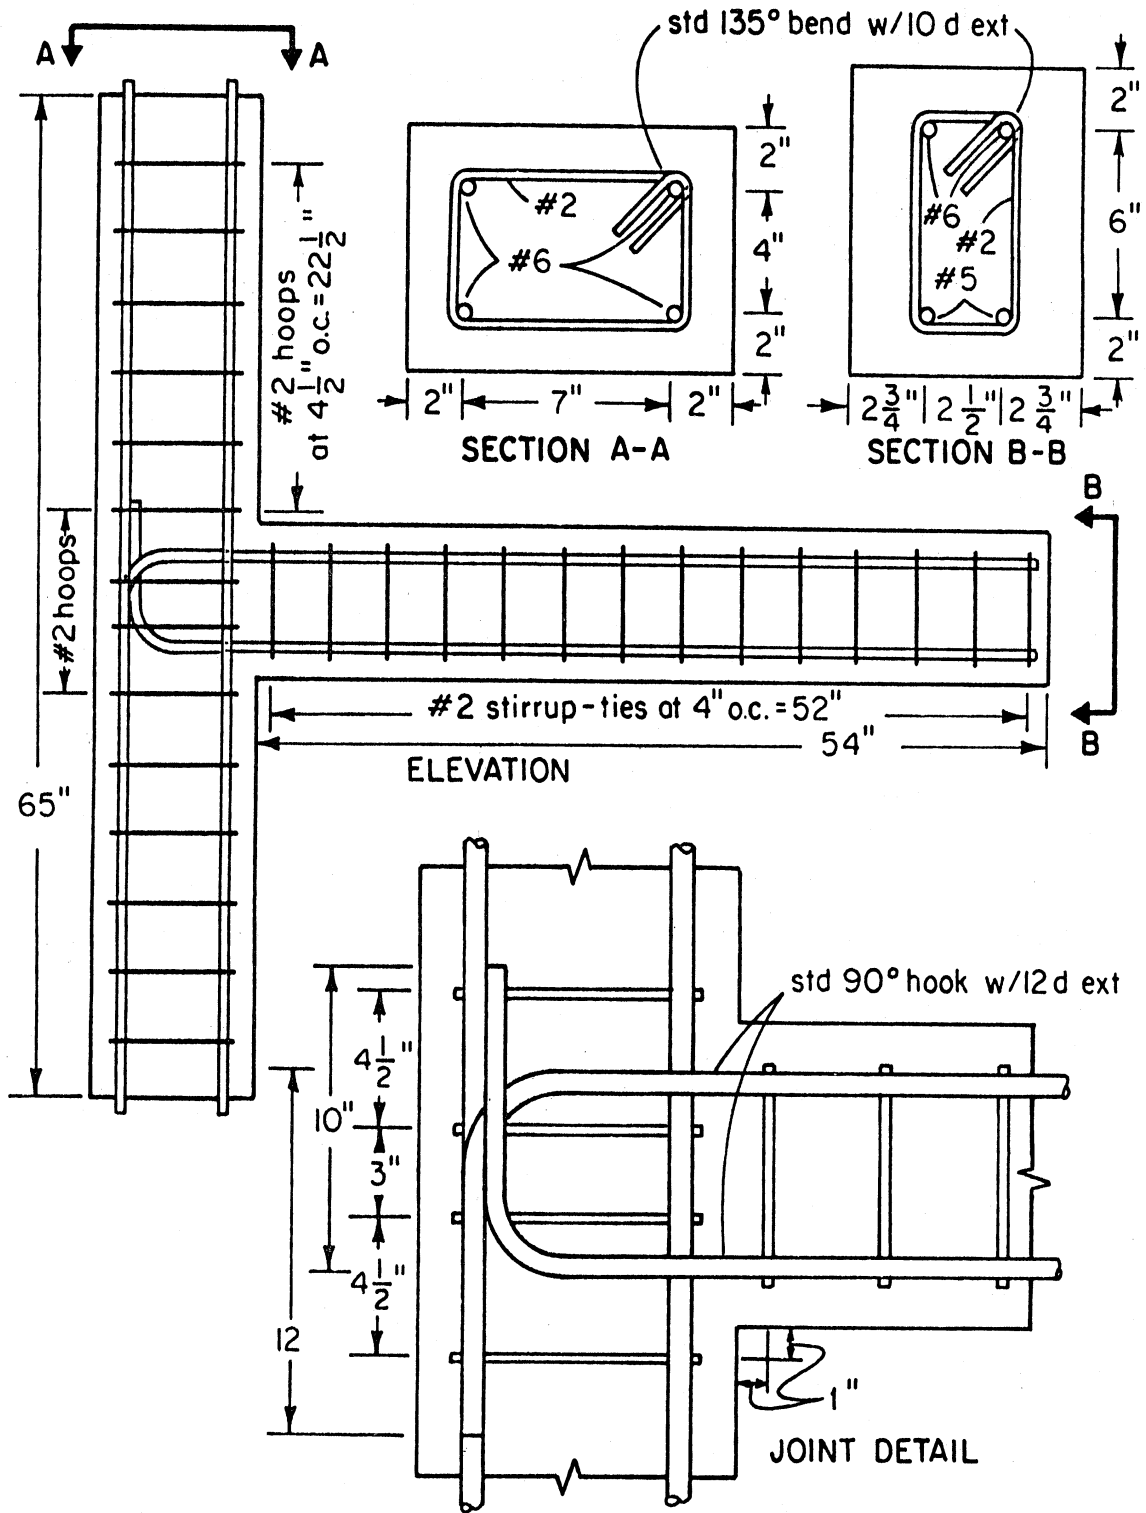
(a) Details of Beam-Column Subassembly for Type I Design
